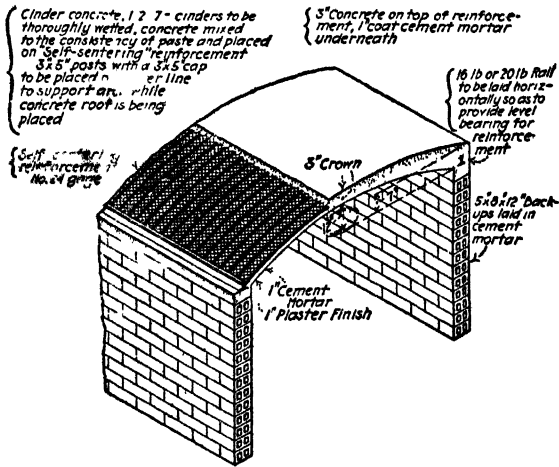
Reinforced concrete overcast supported on terra-cotta blocks used by the Consolidation Coal Co
